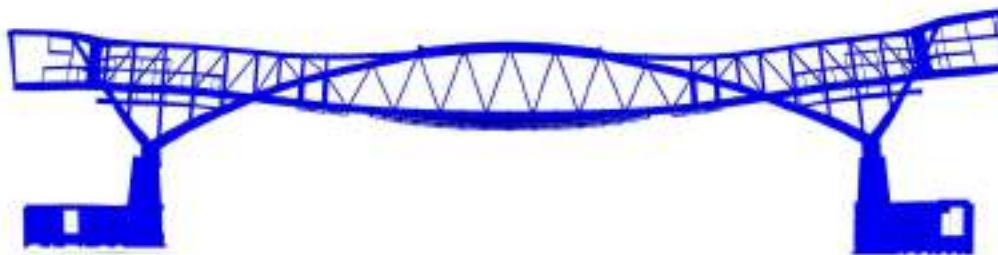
Deformed shape of the Main Bridge predicted by structural model at placement of Arch Truss
